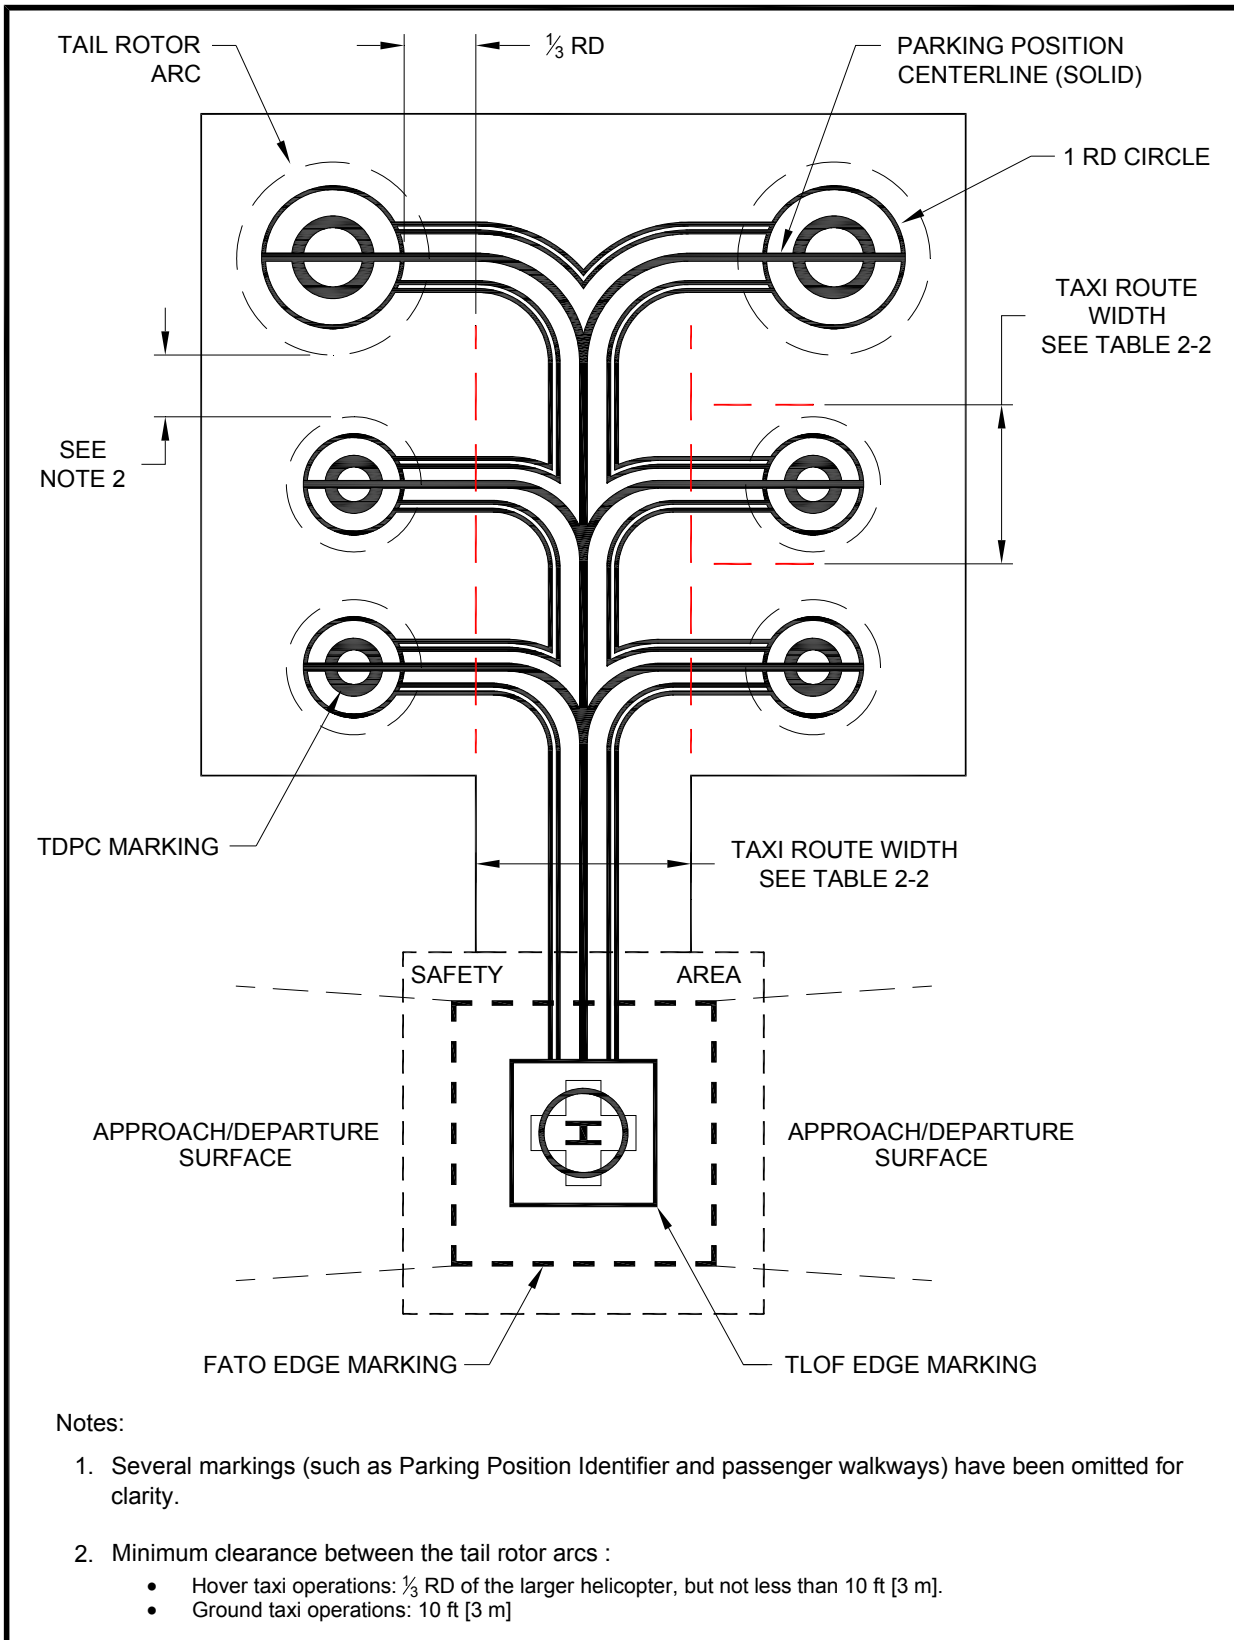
Parking Area Design – “Turn-around” Parking Positions: Hospital
